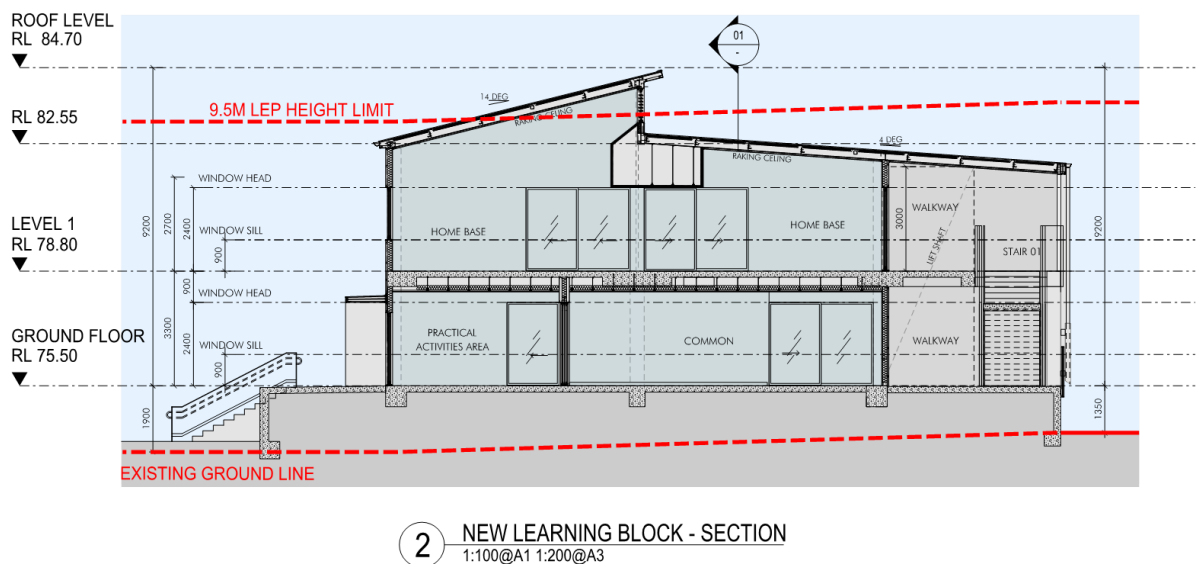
Section of proposed Learning Block, 9.5m building height limit indicated by red dotted line (Source: SARM Architects)
